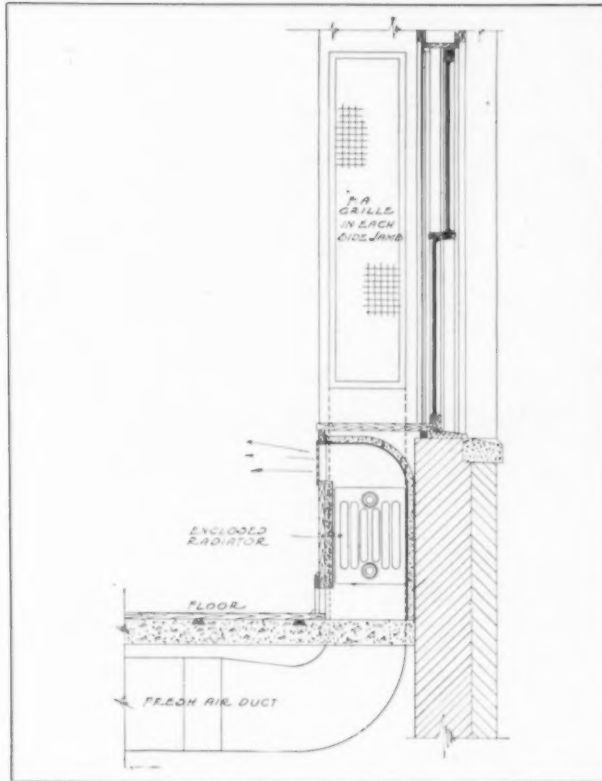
Typical Method of Providing Fresh Air for Dining Rooms, Ball Rooms, Etc.
